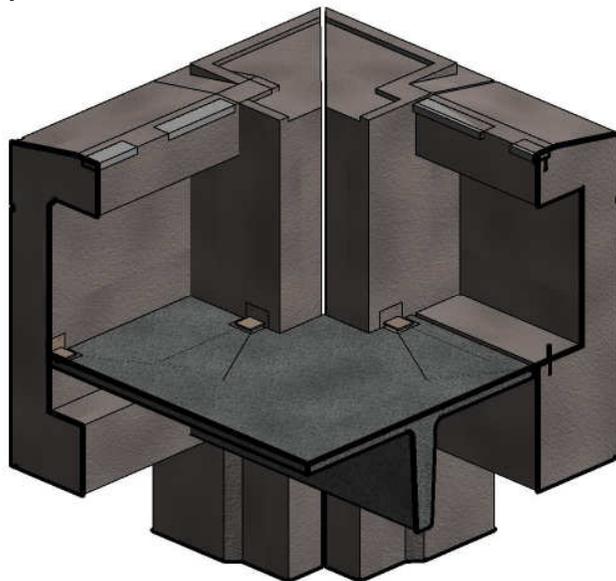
PRECAST BEAM-COLUMN CONNECTION
